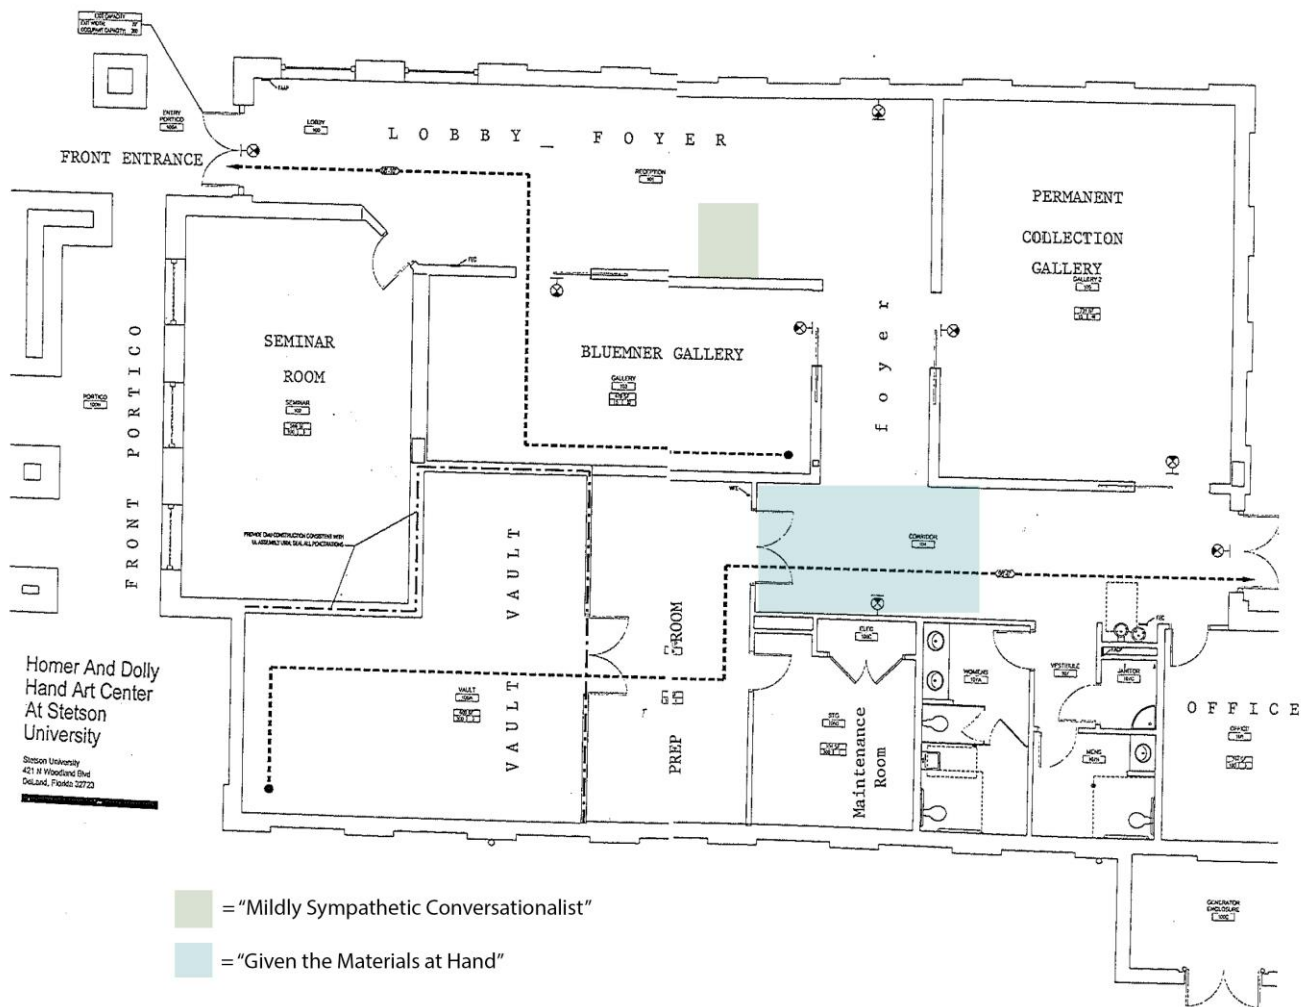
Hand Art Center: architectural plan view depicting placement of works. (Portion of the figure provided by Dr. Nathan Wolek)
